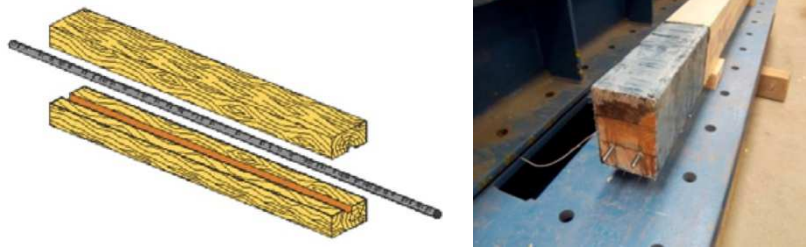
Specimens for adhesion tests (left) and post-tensioned beams (right) (154)
